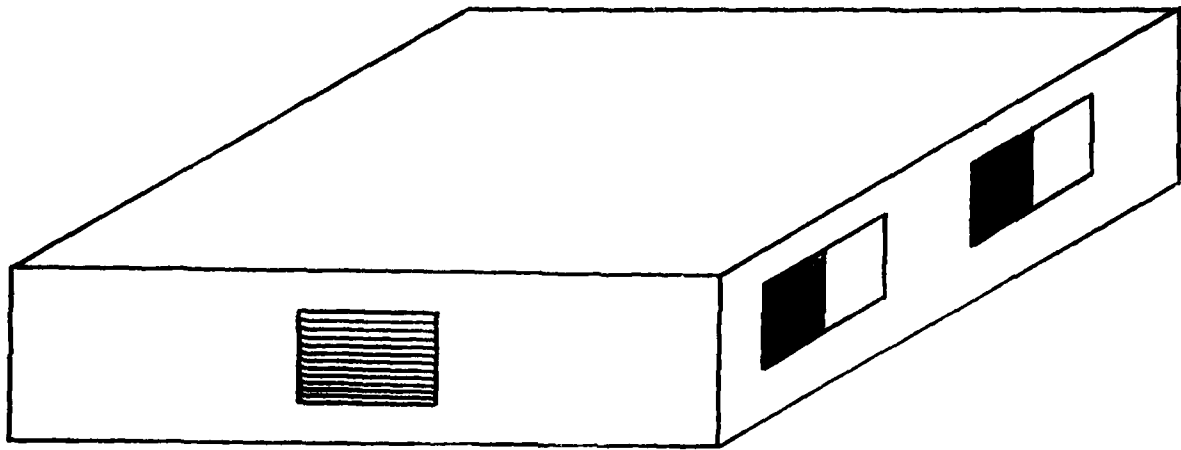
Example 8 Window configuration. Layout is identical to that for Example 7, except that drapes on south wall have been replaced by horizontal blinds.
